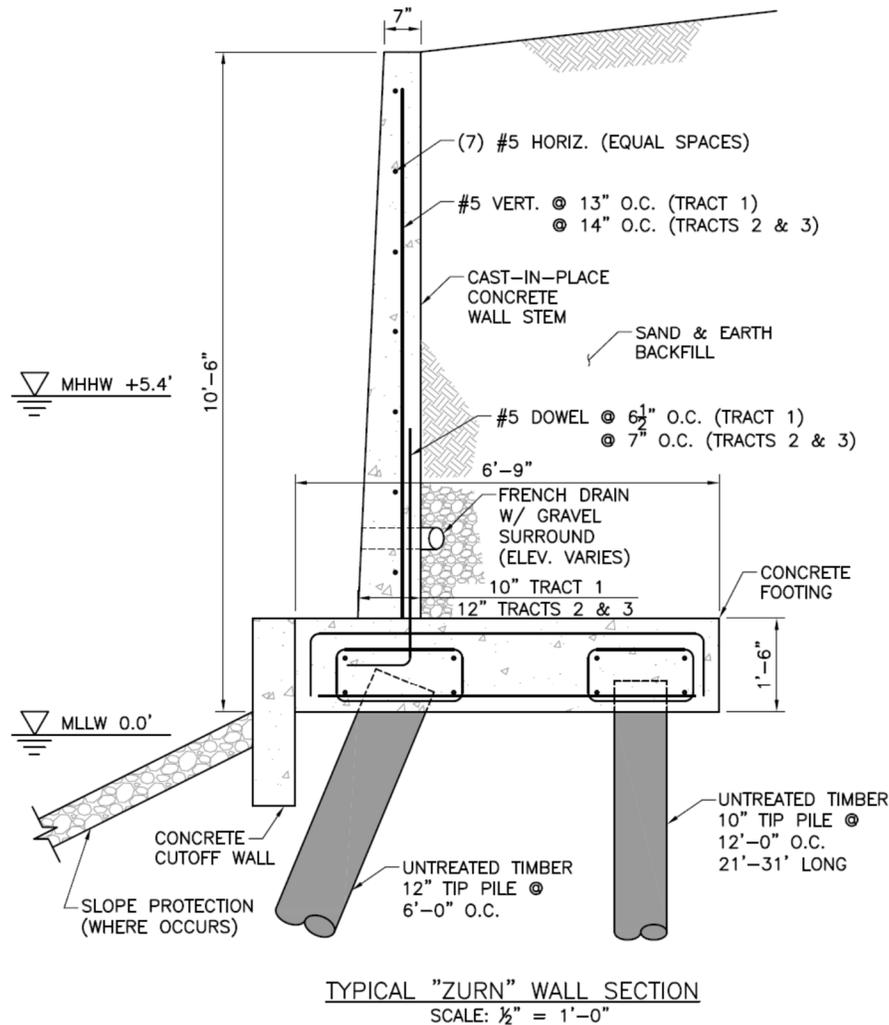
Typical Zurn wall [from TranSystems (2017)]
